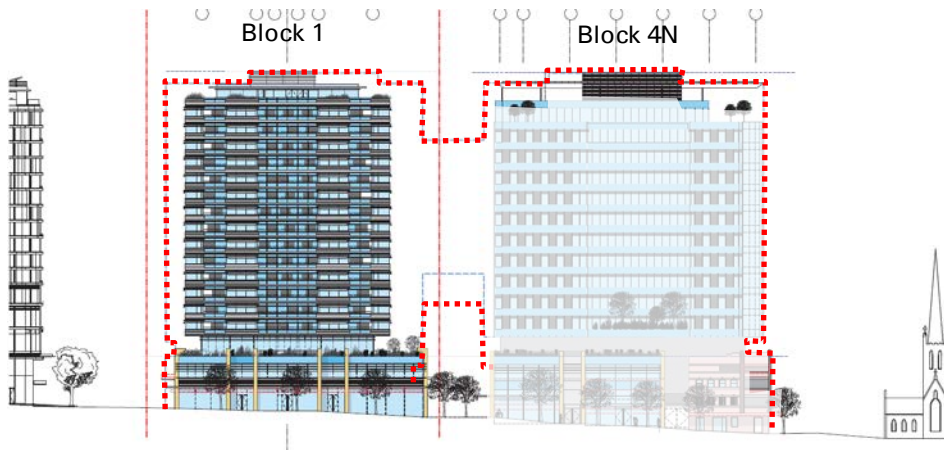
Northern Elevation of Block 1 +4N (Concept Plan outline shown in red)
